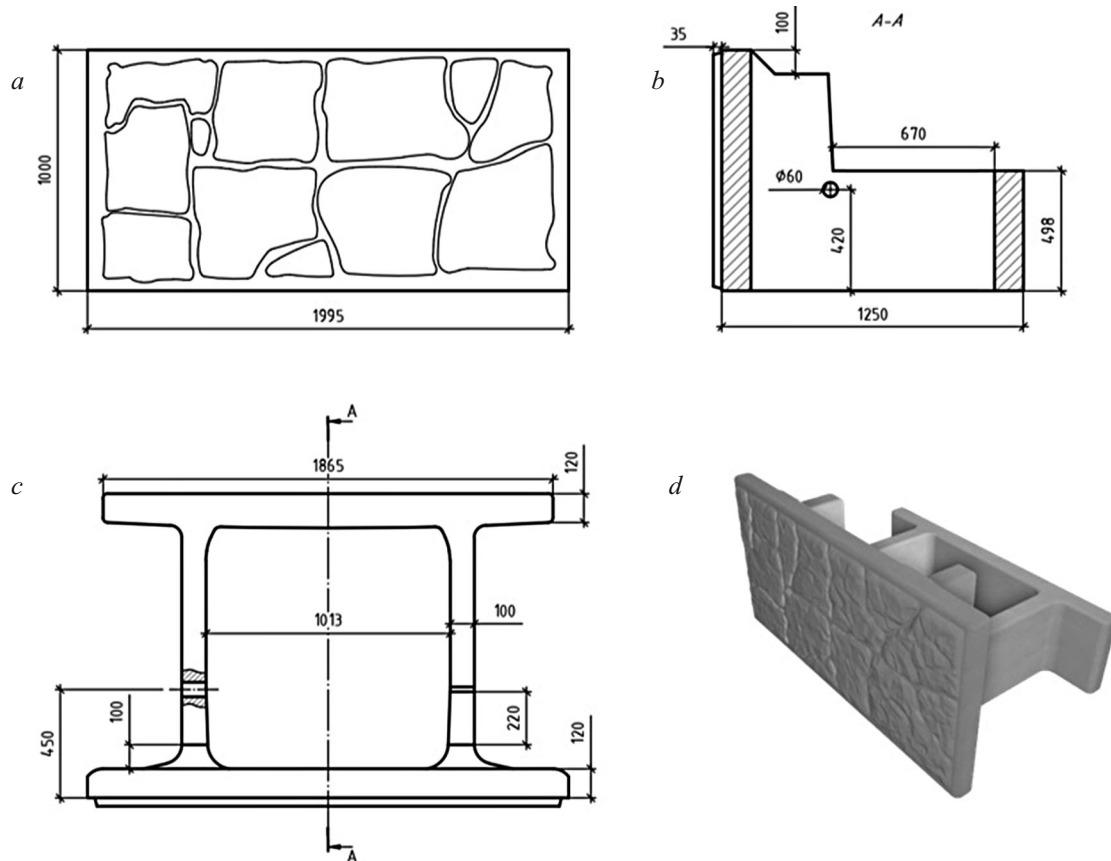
KBP 100/200 block [4]: *a* — front view; *b* — cross-section; *c* — top view; *d* — axonometry (dimensions in mm).
